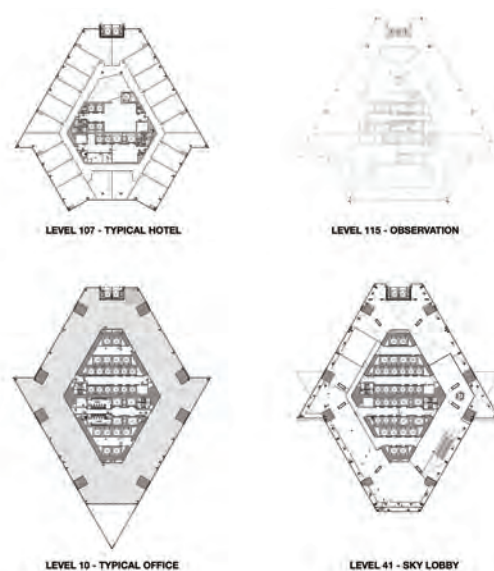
Typical Floor Plans (Source: PMV/Fender Katsalidis)
